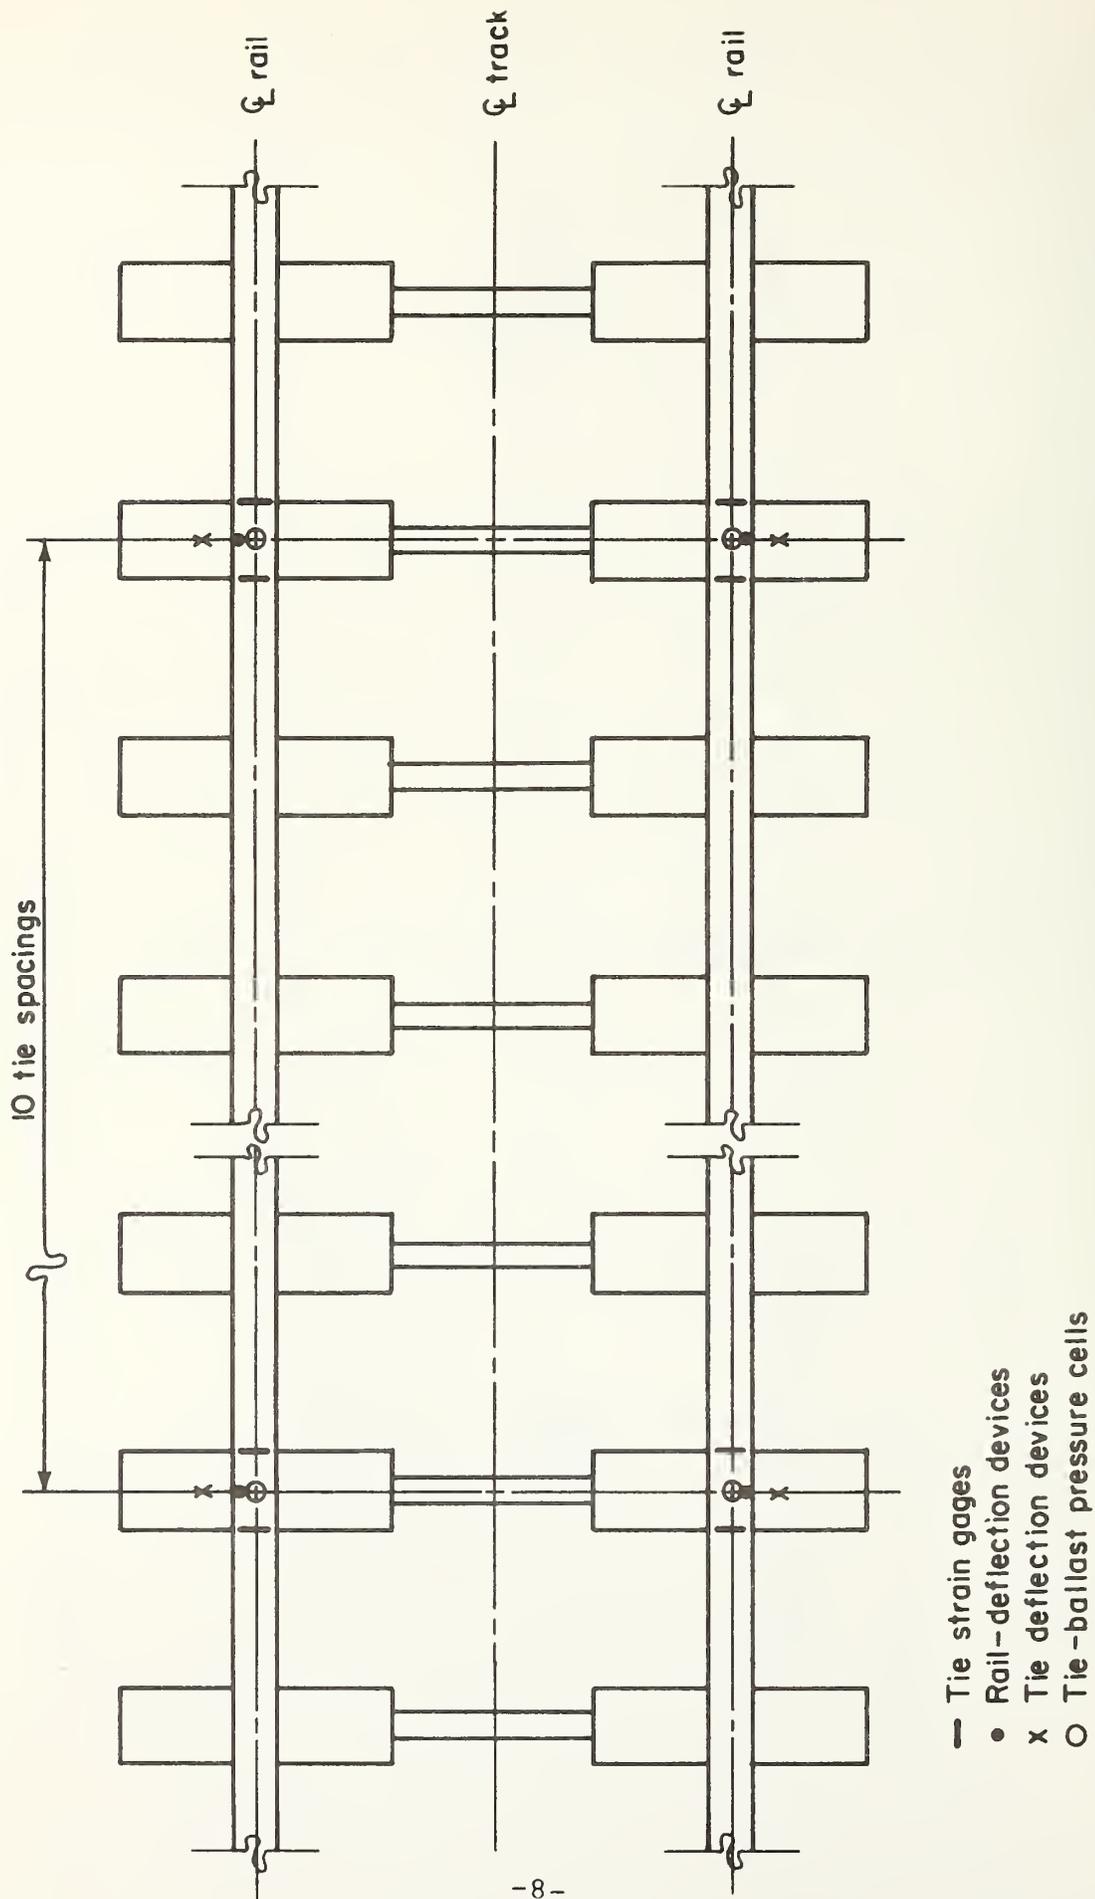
INSTRUMENTATION LAYOUT FOR TWO-BLOCK CONCRETE TIE TRACK
